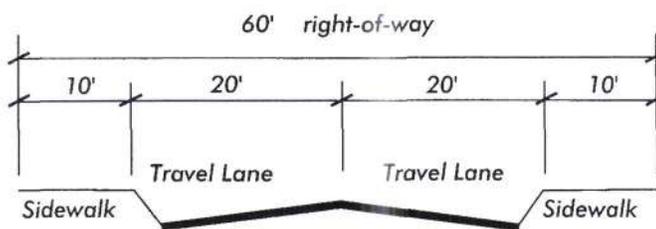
illustrates the existing roadway plan of the arterials and collector/industrial roads, which serve as the principal through travel routes.
